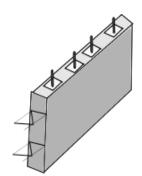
Steel bar reinforcement's placement in hollows core of brick masonry wall. (By Author)
